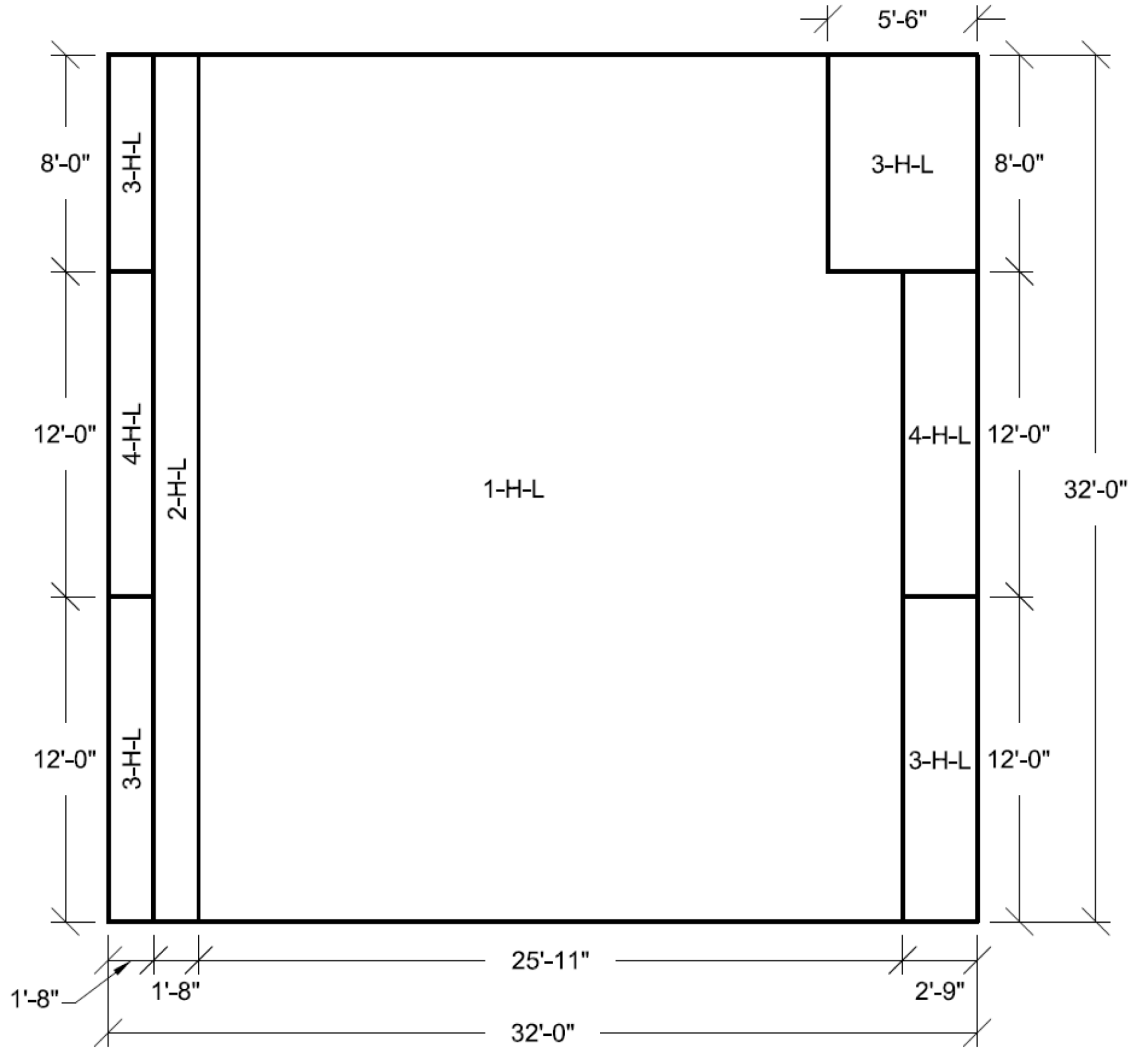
H.6-190 DGFOV Wall 13 Looking From Outside Horizontal Reinforcement Zones Near Side Face
